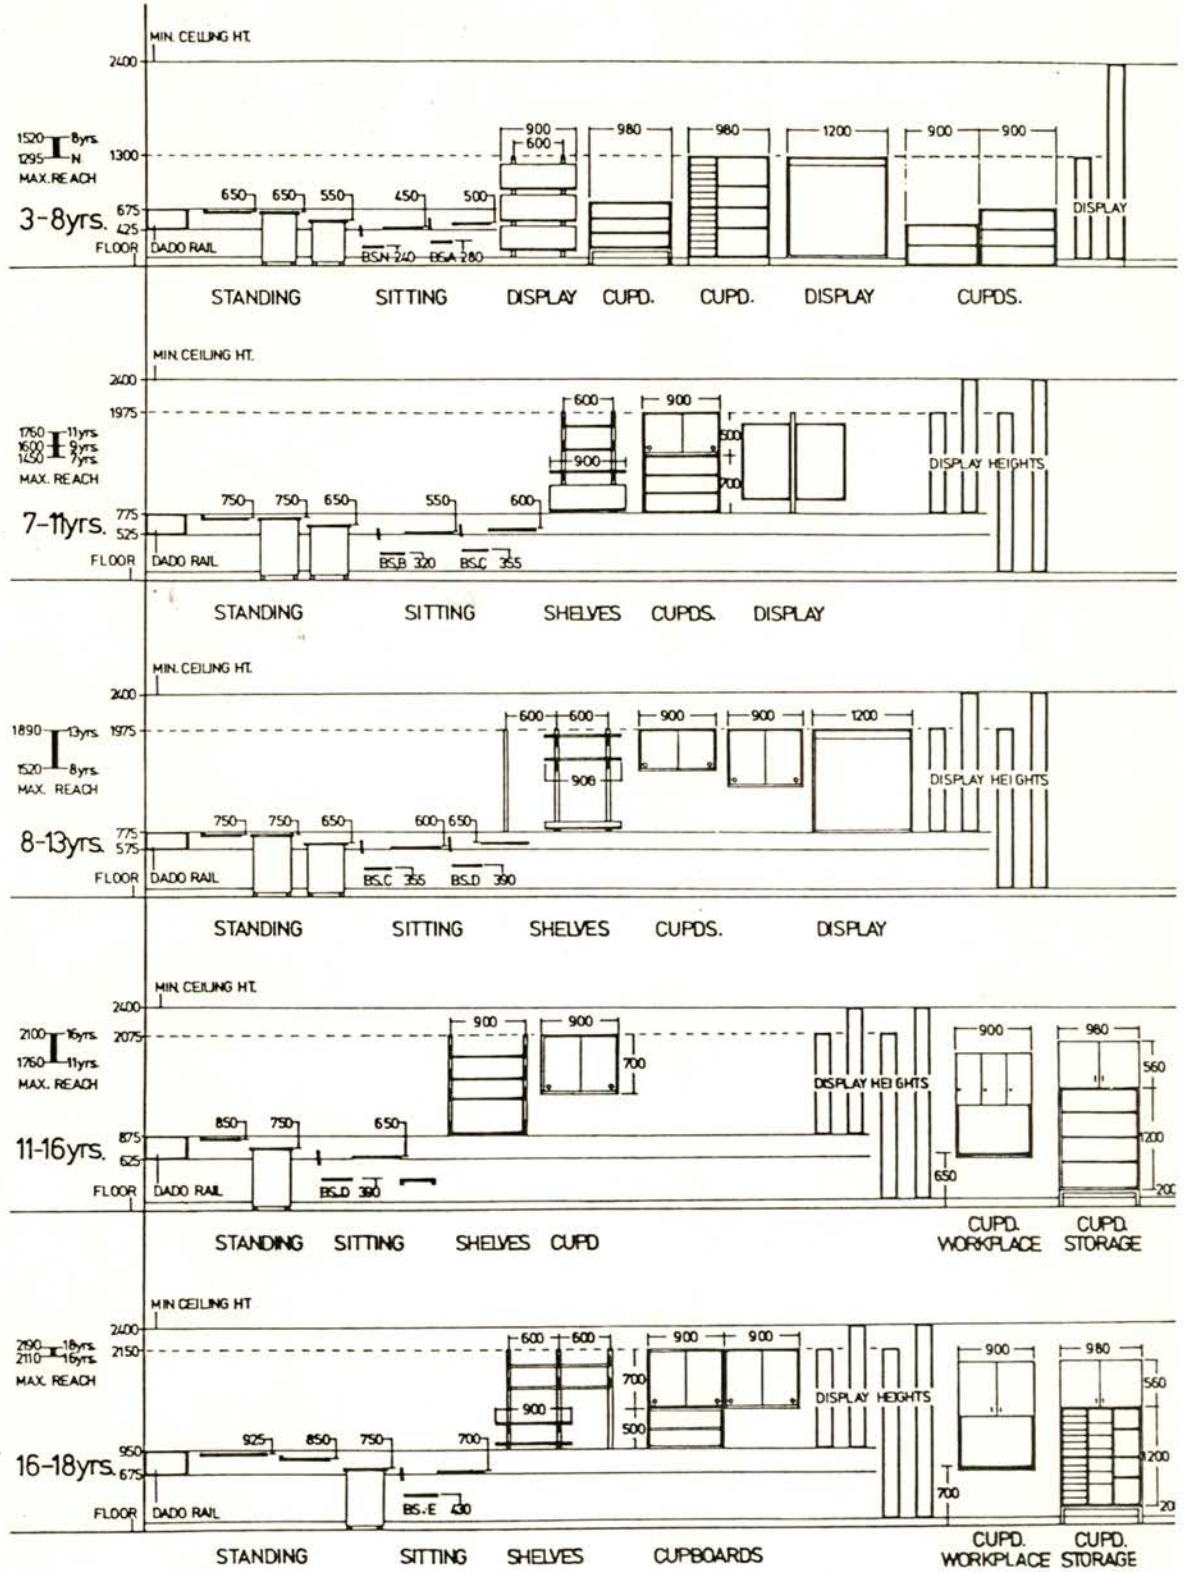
Recommended positioning of wall mounted furniture and equipment
